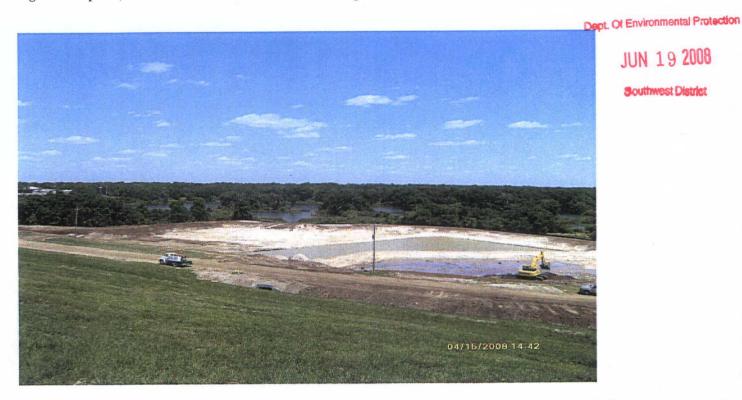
April 15, 2008 Basin C Construction Photo – This photo shows the weekly progress of Basin C modification.
